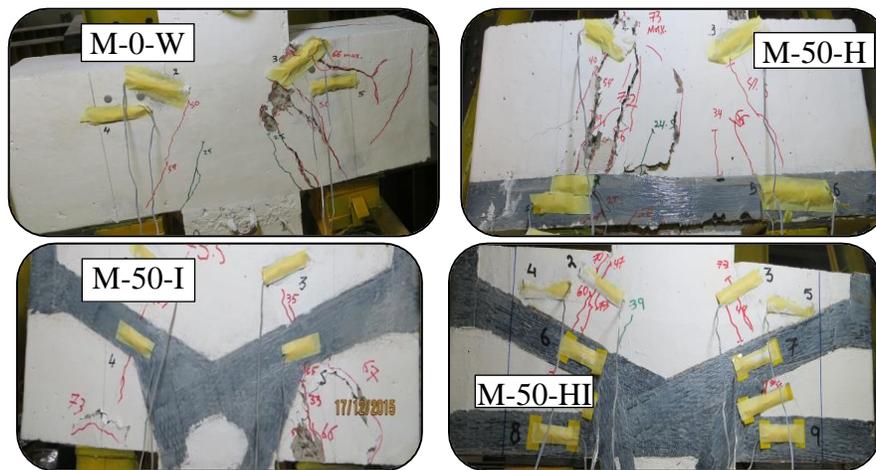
The Crack pattern and Mode of Failure for Monotonically Loaded Specimen
